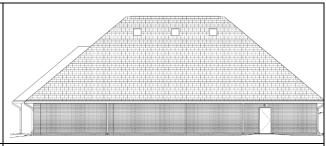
North elevation of building, visible from Bauer Farm Drive.
